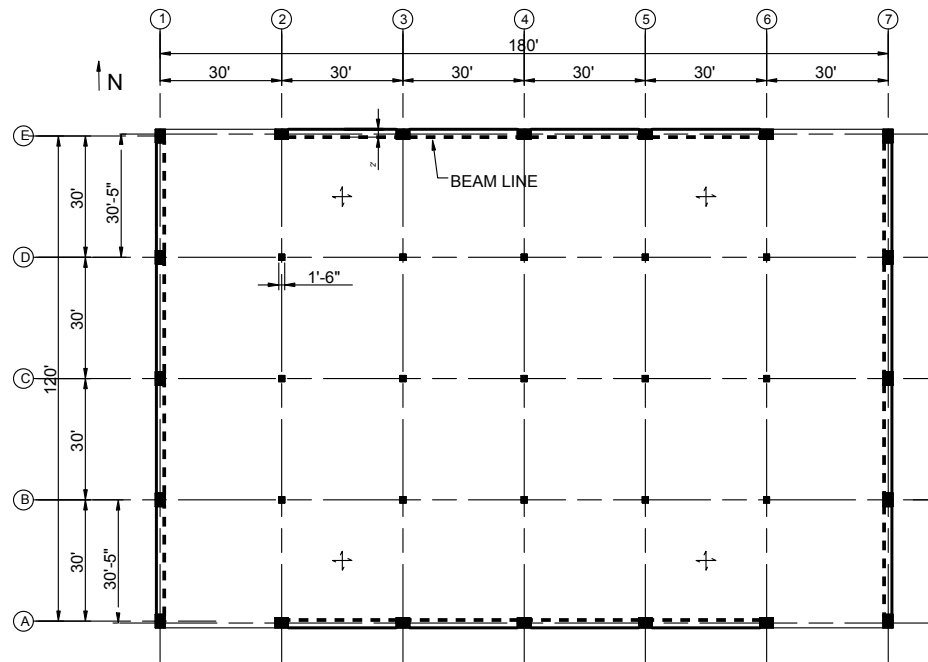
Plan view of one frame of Benchmark building (from Haselton et al. 2008).
